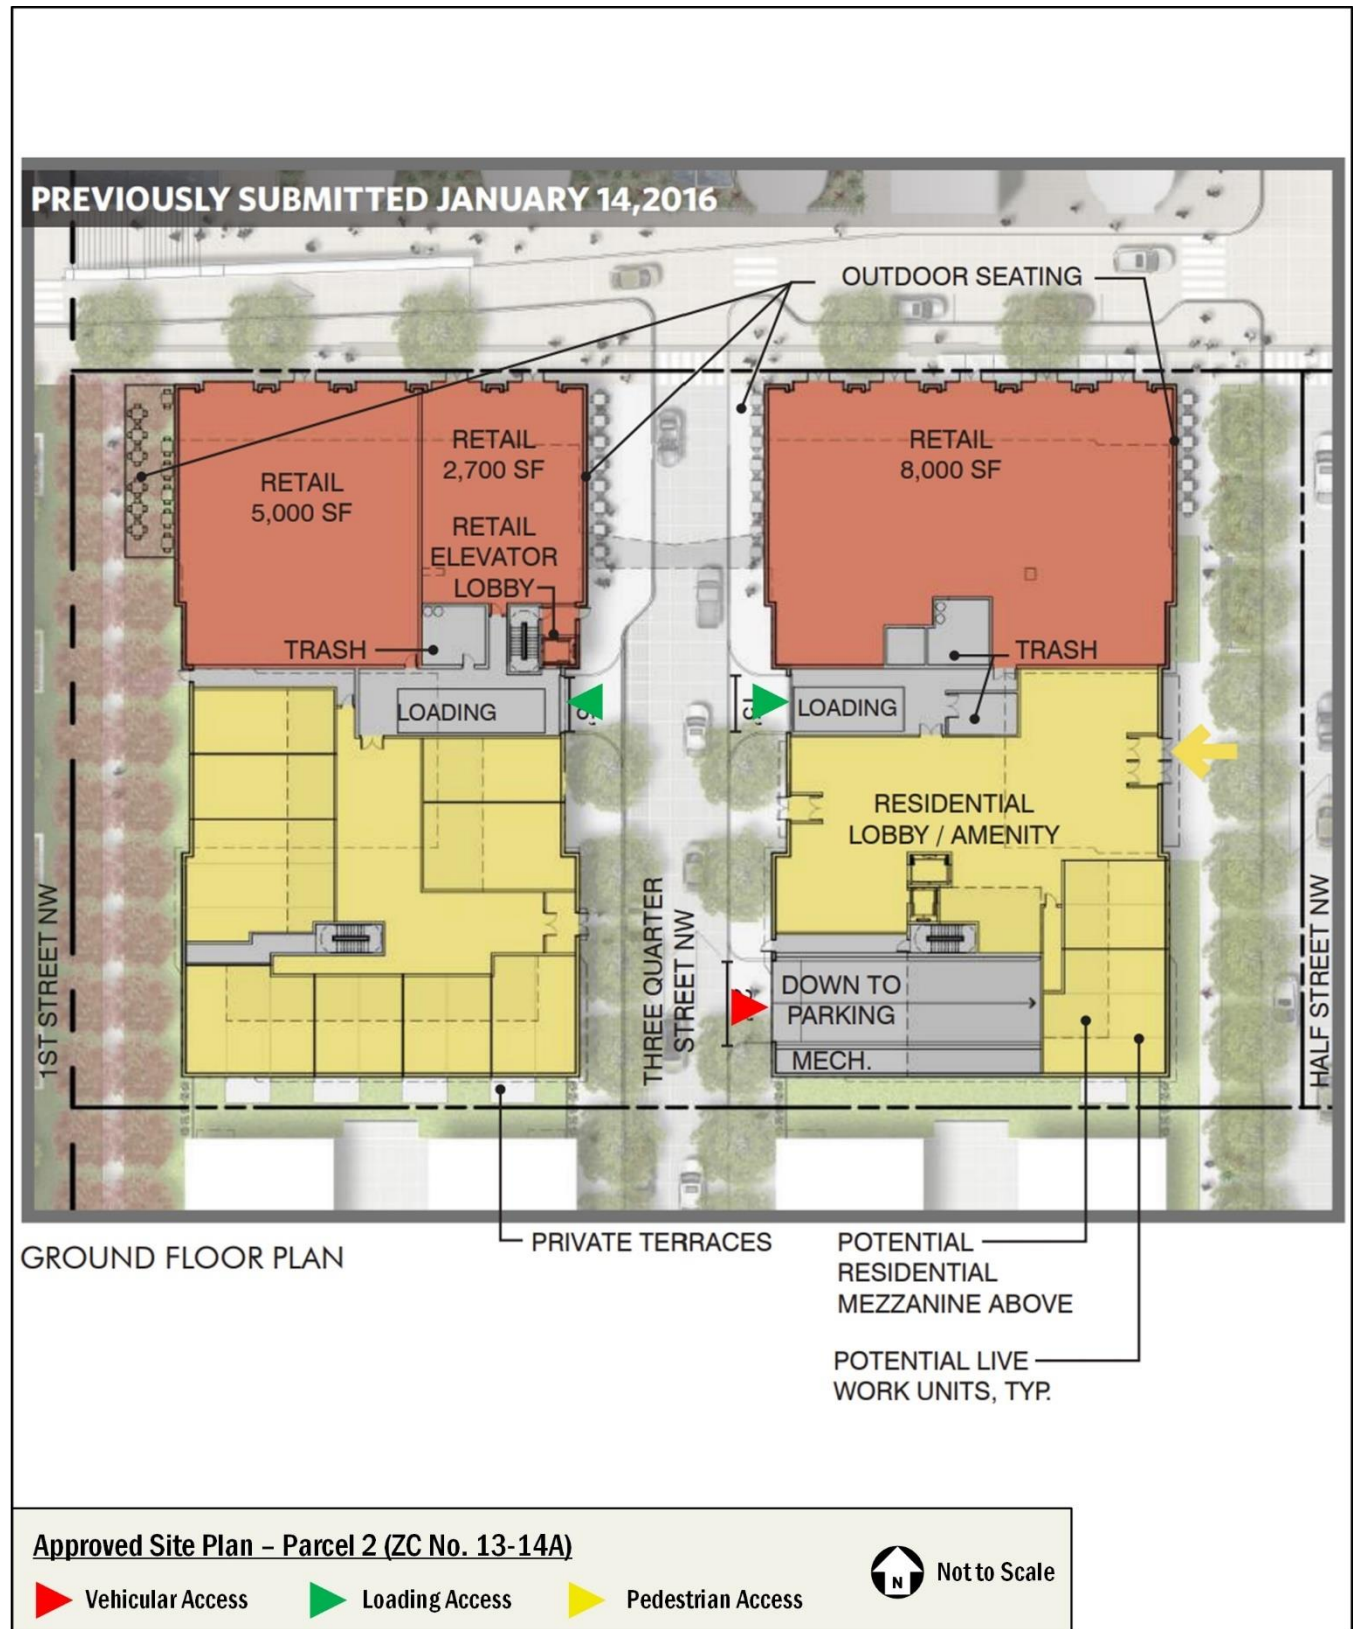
Approved Site Plan – Parcel 2 (ZC No. 13-14A)
